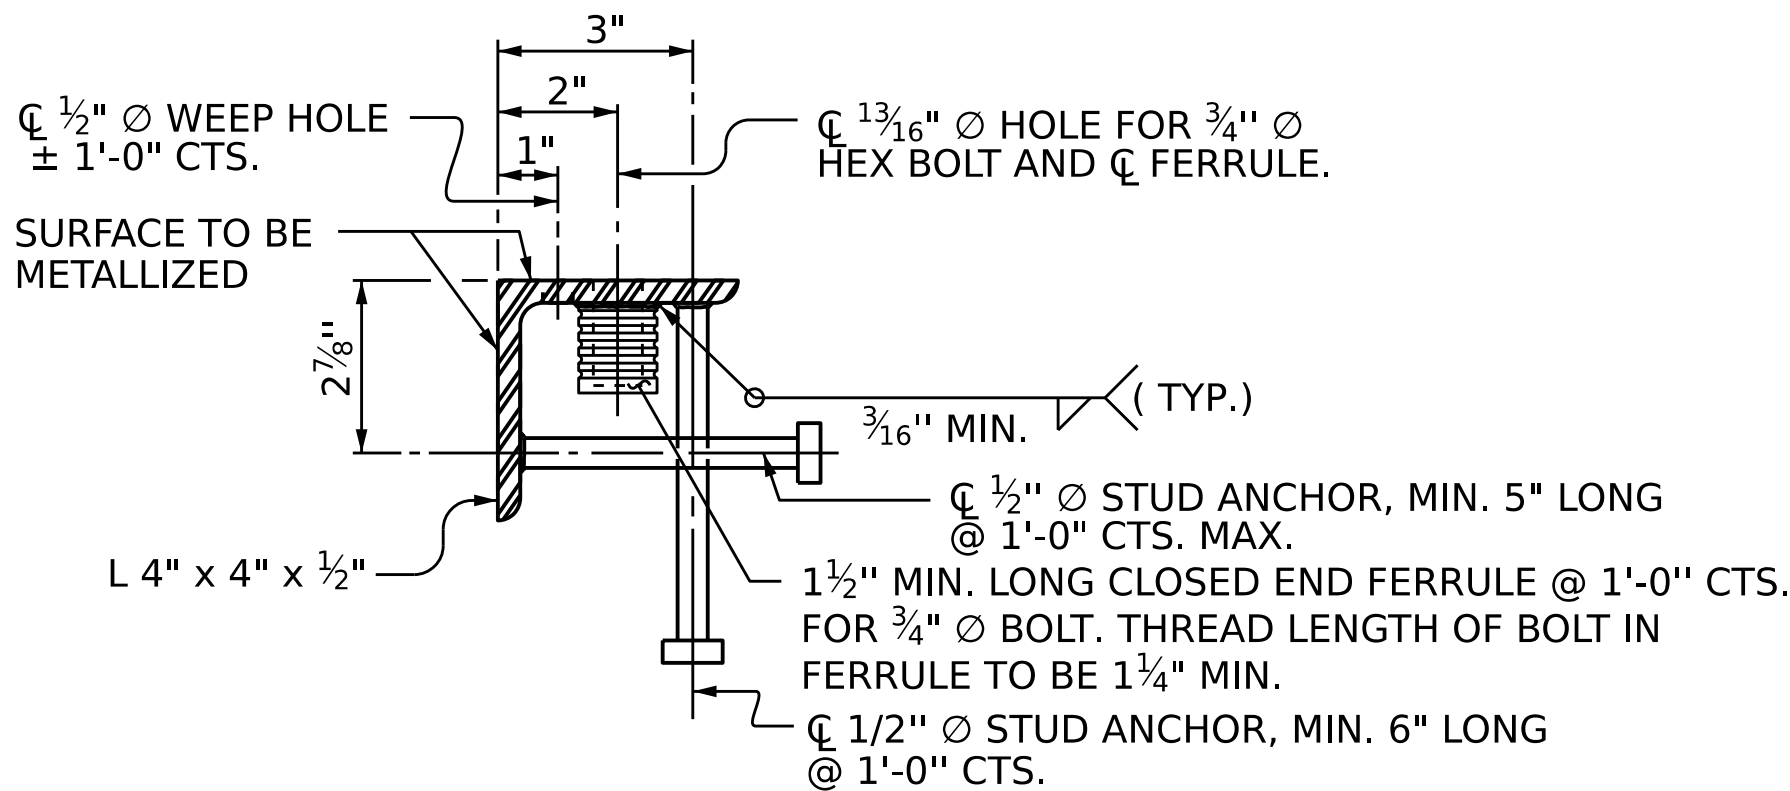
DETAIL- FIELD WELD SPLICE OF BASE ANGLE
